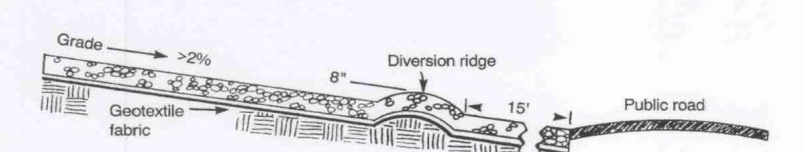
Cross-section of a Construction Entrance/Exit (NC, 1993)
